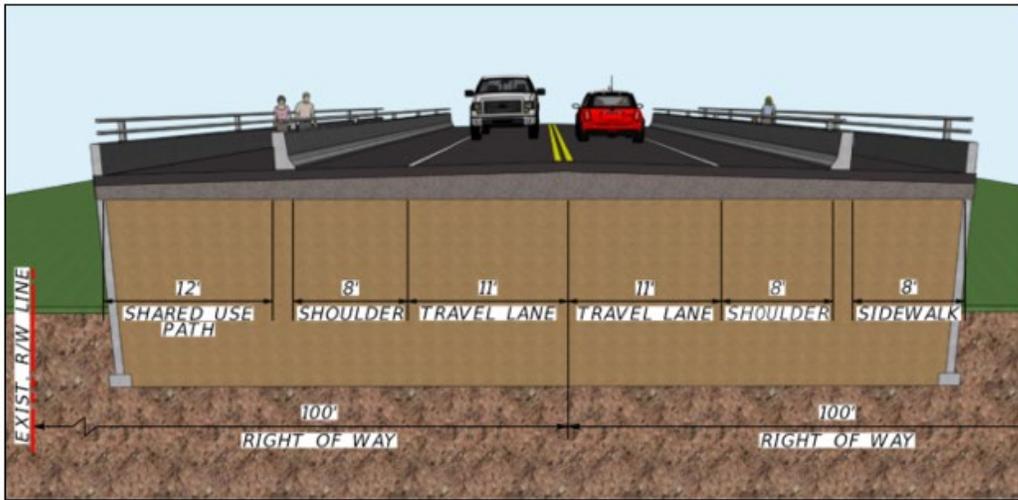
Preferred Alternative – S.R. 789 (Longboat Key) Bridge
